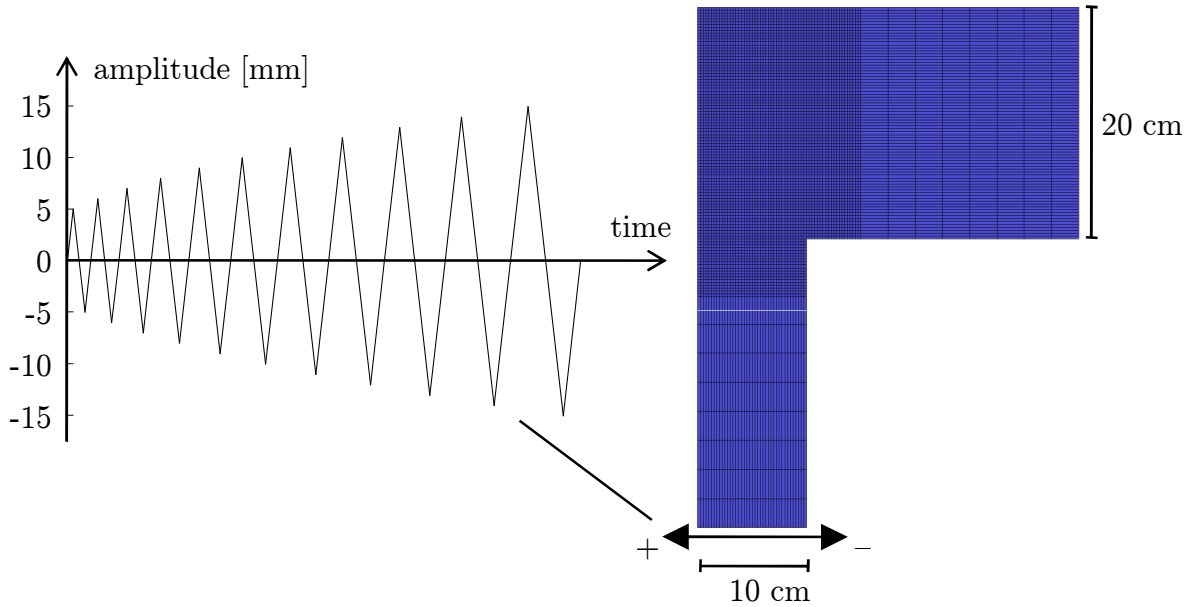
Geometry, loading history, and loading direction (+/-) of the frame corner
